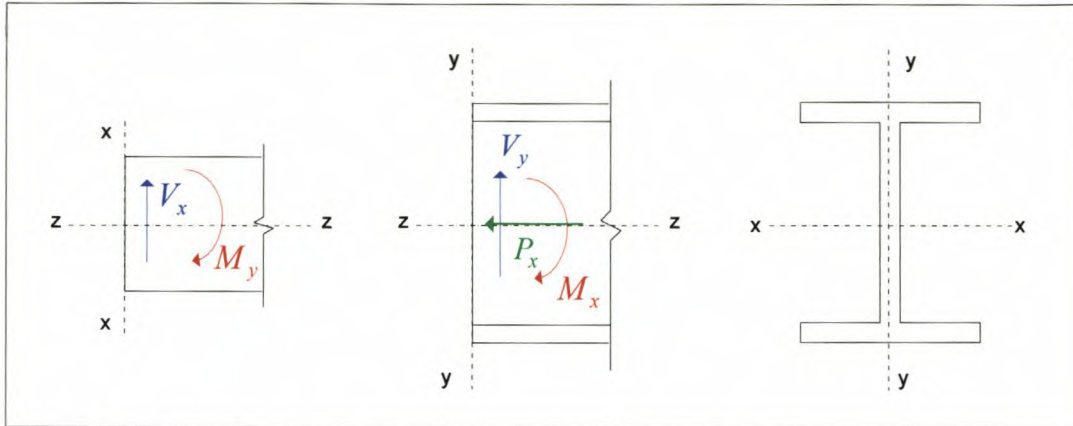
Axis Definition for Beam Column Moment Connection
